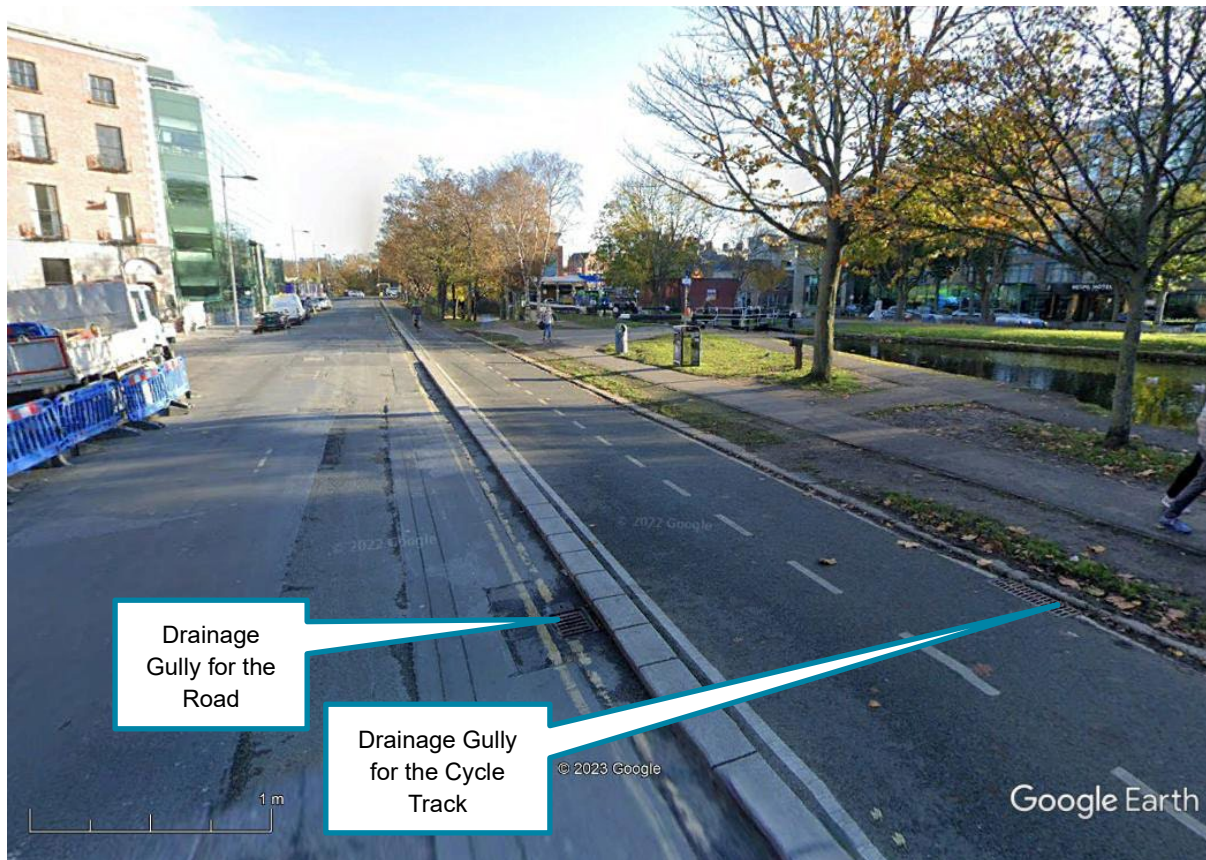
Example of Cycleway with separate drainage system at Grand Canal, Wilton Place
